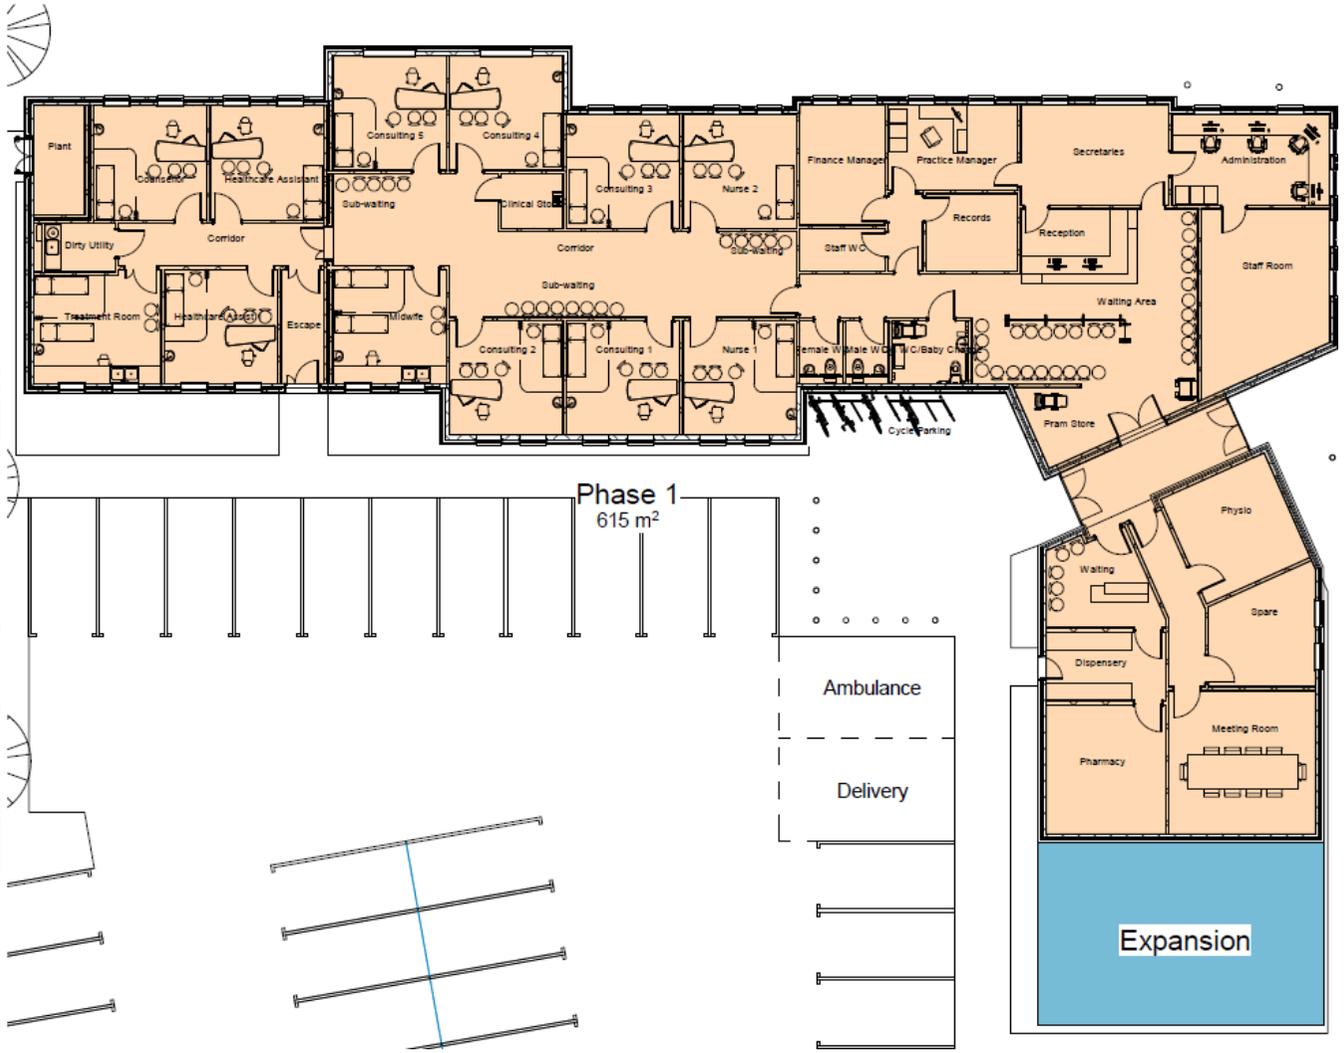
Proposed site plan (Drawing No. 15/959 210 Rev. F)
